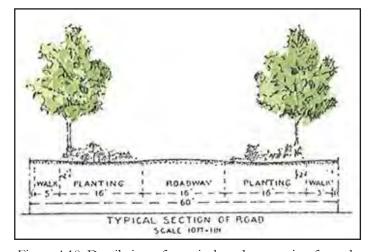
Detail view of a typical roadway section from the 1895 Olmsted plan (Tufts Archives).
